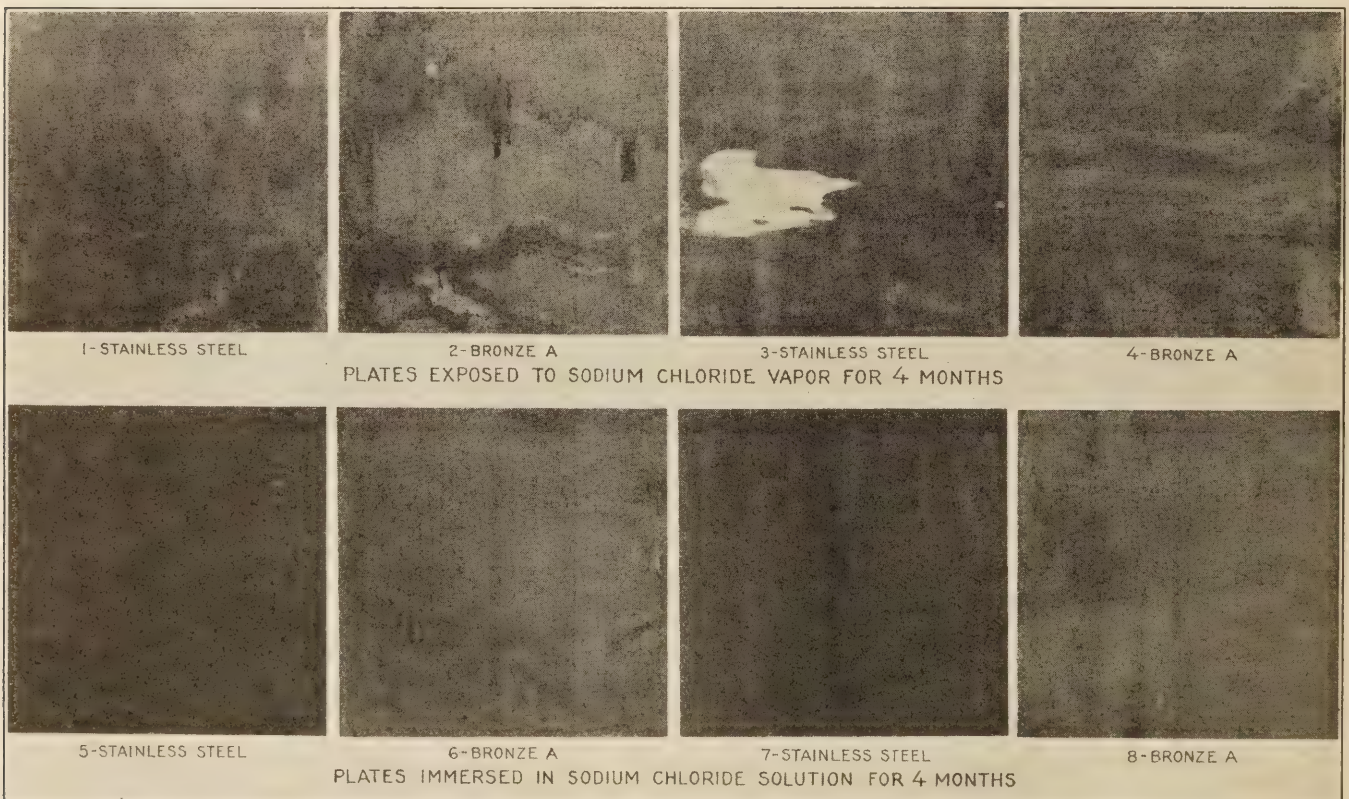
APPEARANCES OF BRONZE AND STAINLESS STEEL BEARING PLATES AFTER IMMERSION IN AND EXPOSURE TO SODIUM CHLORIDE. STRIPS OF WOOD INSULATED THE IRON CLAMPS FROM THE PLATES. NOS. 1, 2, 5, AND 6 WERE CONTACT FACES, AND NOS. 3, 4, 7, AND 8 WERE OUTER FACES OF PLATES.
